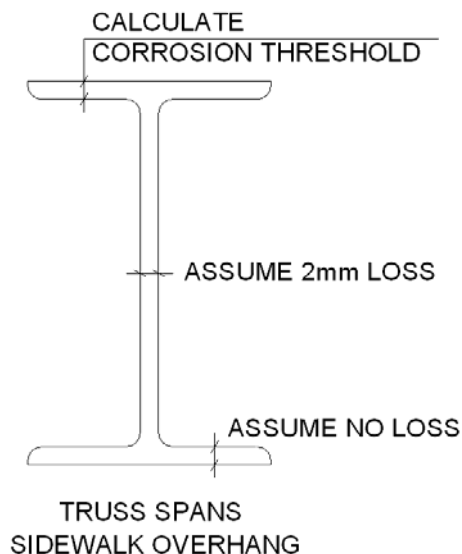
Sidewalk Floorbeam Section Loss and Corrosion Threshold
